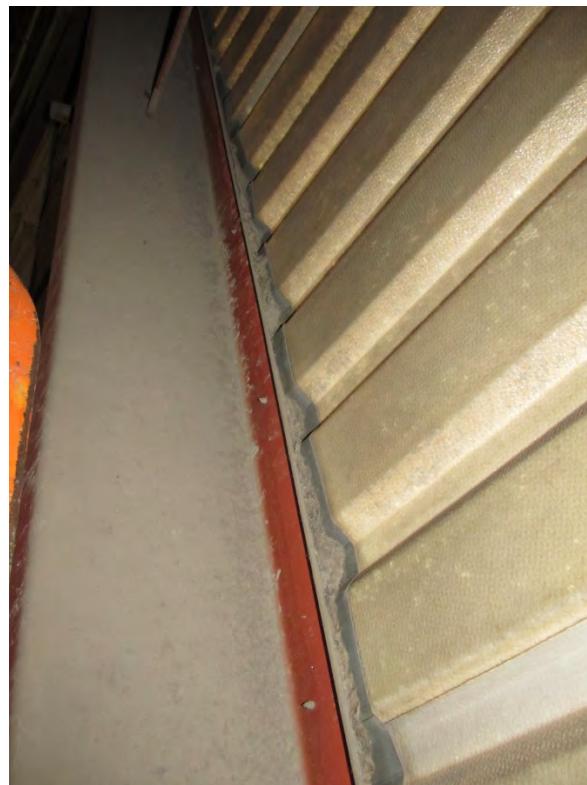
Sample 069 dust at the base of the elevated corrugated siding near Column A5
